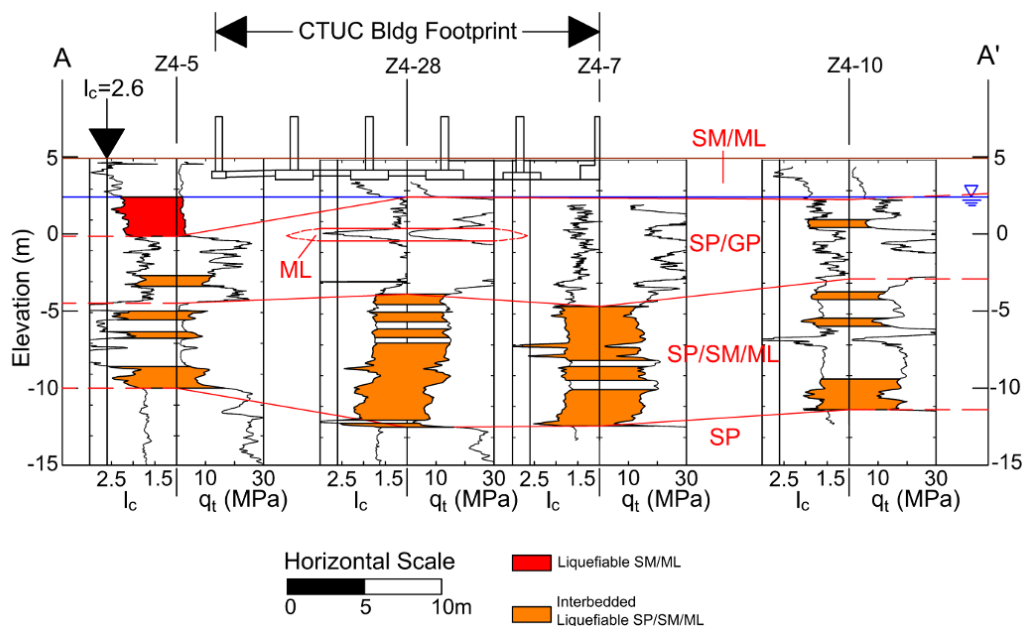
Subsurface conditions at CTUC building site indicating layers that have liquefied in the Christchurch earthquake according to CPT-based triggering analysis; note the presence of shallow liquefiable soils just beneath the foundations at the southeast corner where the largest settlement of ~30 cm was observed (Figure 6b)
